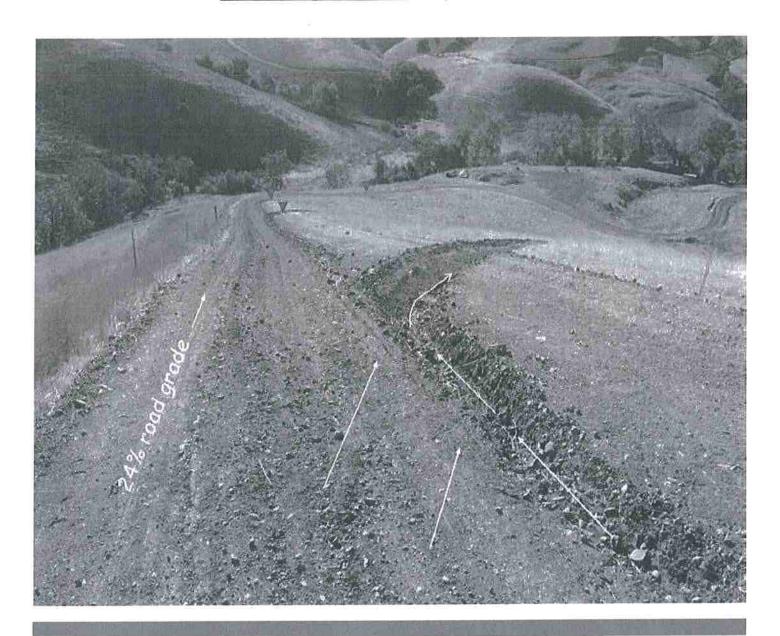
Steep roads that go straight up or down a hillside are very difficult to drain. This steep, fall line road developed a through out cross section that was drained using lead out ditches to direct runoff off the road and onto the adjacent, vegetated hillside. The road was "outsloped" to drain runoff to the right side, and the lead out ditch was built slightly steeper than the road grade, to be self-cleaning. Four lead out ditches have been constructed at 100-foot intervals to the bottom of the hillside.
